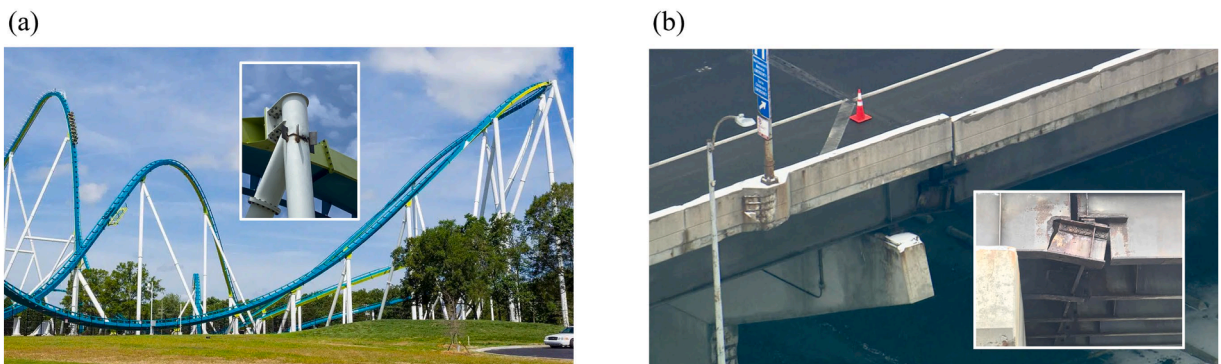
(a) Cracked roller coaster column [12]. (b) Cracked beam on Lake Shore Drive Bridge [13].
